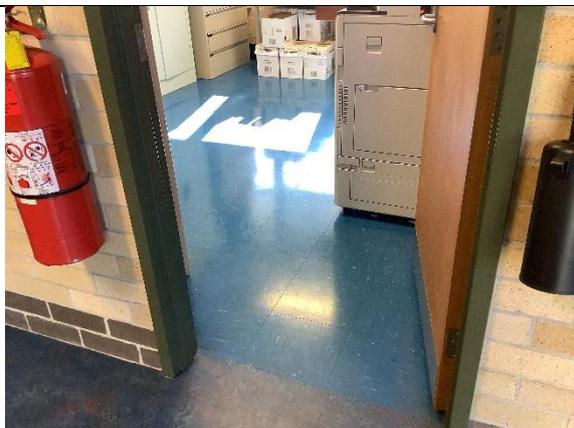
Building H – H.1.6 – Throughout – Floor Covering – Vinyl Tiles - Blue
